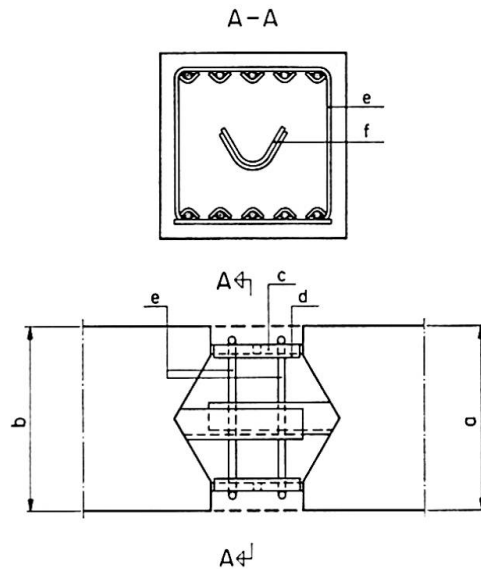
Joints made by using bent steel plates. The plate and the bars have the same centre joint and the jointing steel is not to be deformed, as shown in Fig. 6. Note the use of the supporting steel elements for keeping the concrete elements in place before welding. The shear reinforcement is an extra safety factor.
